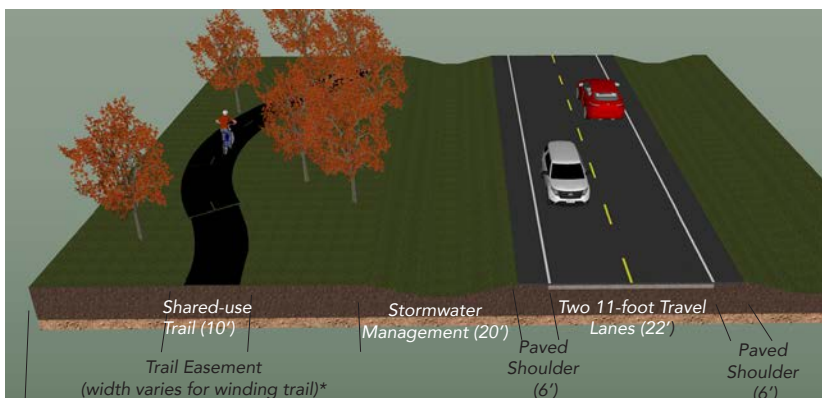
Typical section for segments of New Road where open drainage will remain (west of Canary Creek). Dimensions shown are for typical conditions but specific constraints such as wetlands, impact to adjoining properties, preservation of existing drainage or stormwater facilities, or other natural and cultural resource preservation may require narrower pavement widths, alternative drainage practices, or a narrower trail section. Meandering trail as shown requires cooperation with developer. Shallower curves are applicable where constraints limit trail corridor.
